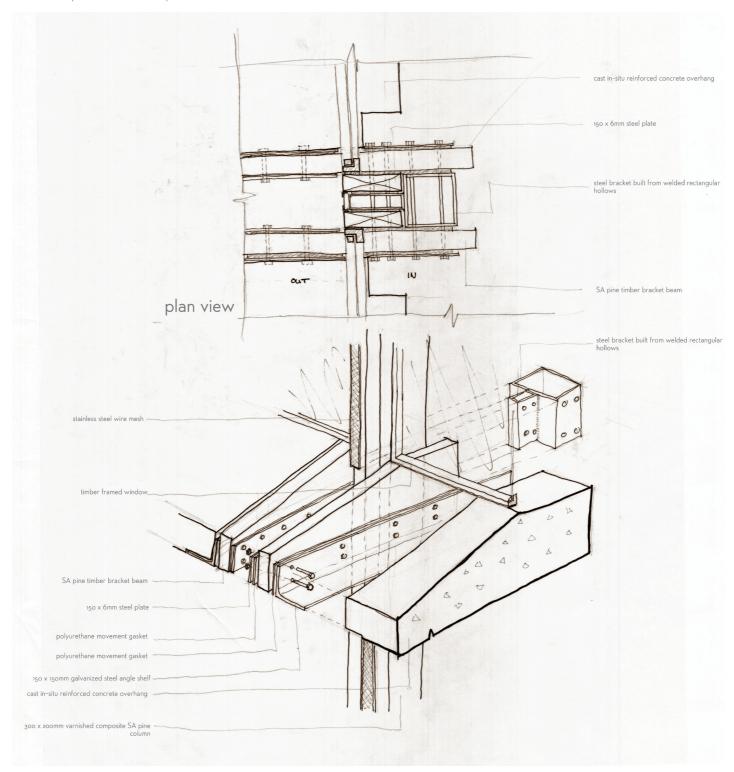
Detail of concrete overhang supported by timber columns (Author 2014).
